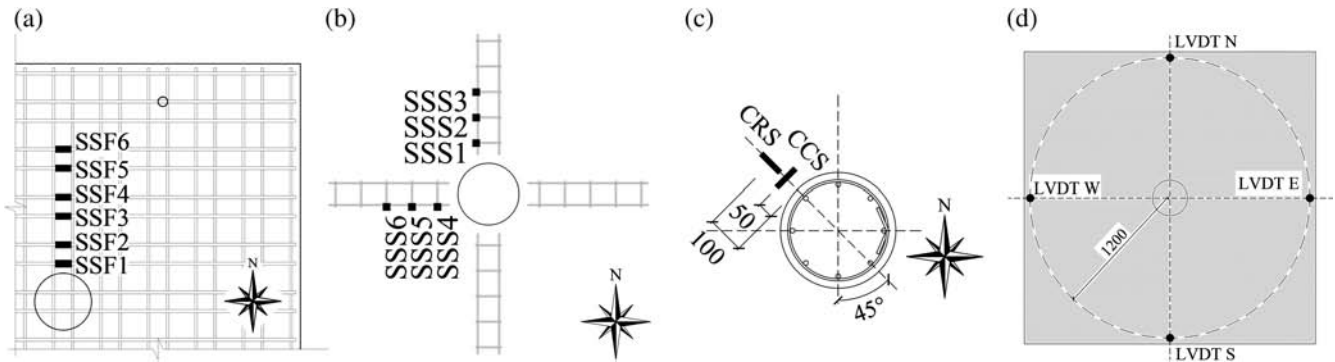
Monitoring system: Arrangement of strain gauges attached on the (a) top flexural reinforcement (that will be in tension), (b) stirrups, (c) slab's bottom concrete surface, (d) Arrangement of linear variable-displacement transducers (dimensions in mm)
